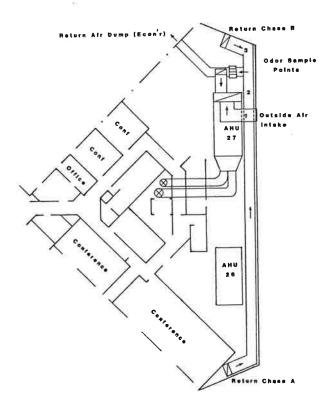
Ground-floor level of patient tower 1 with location of odor sampling points
